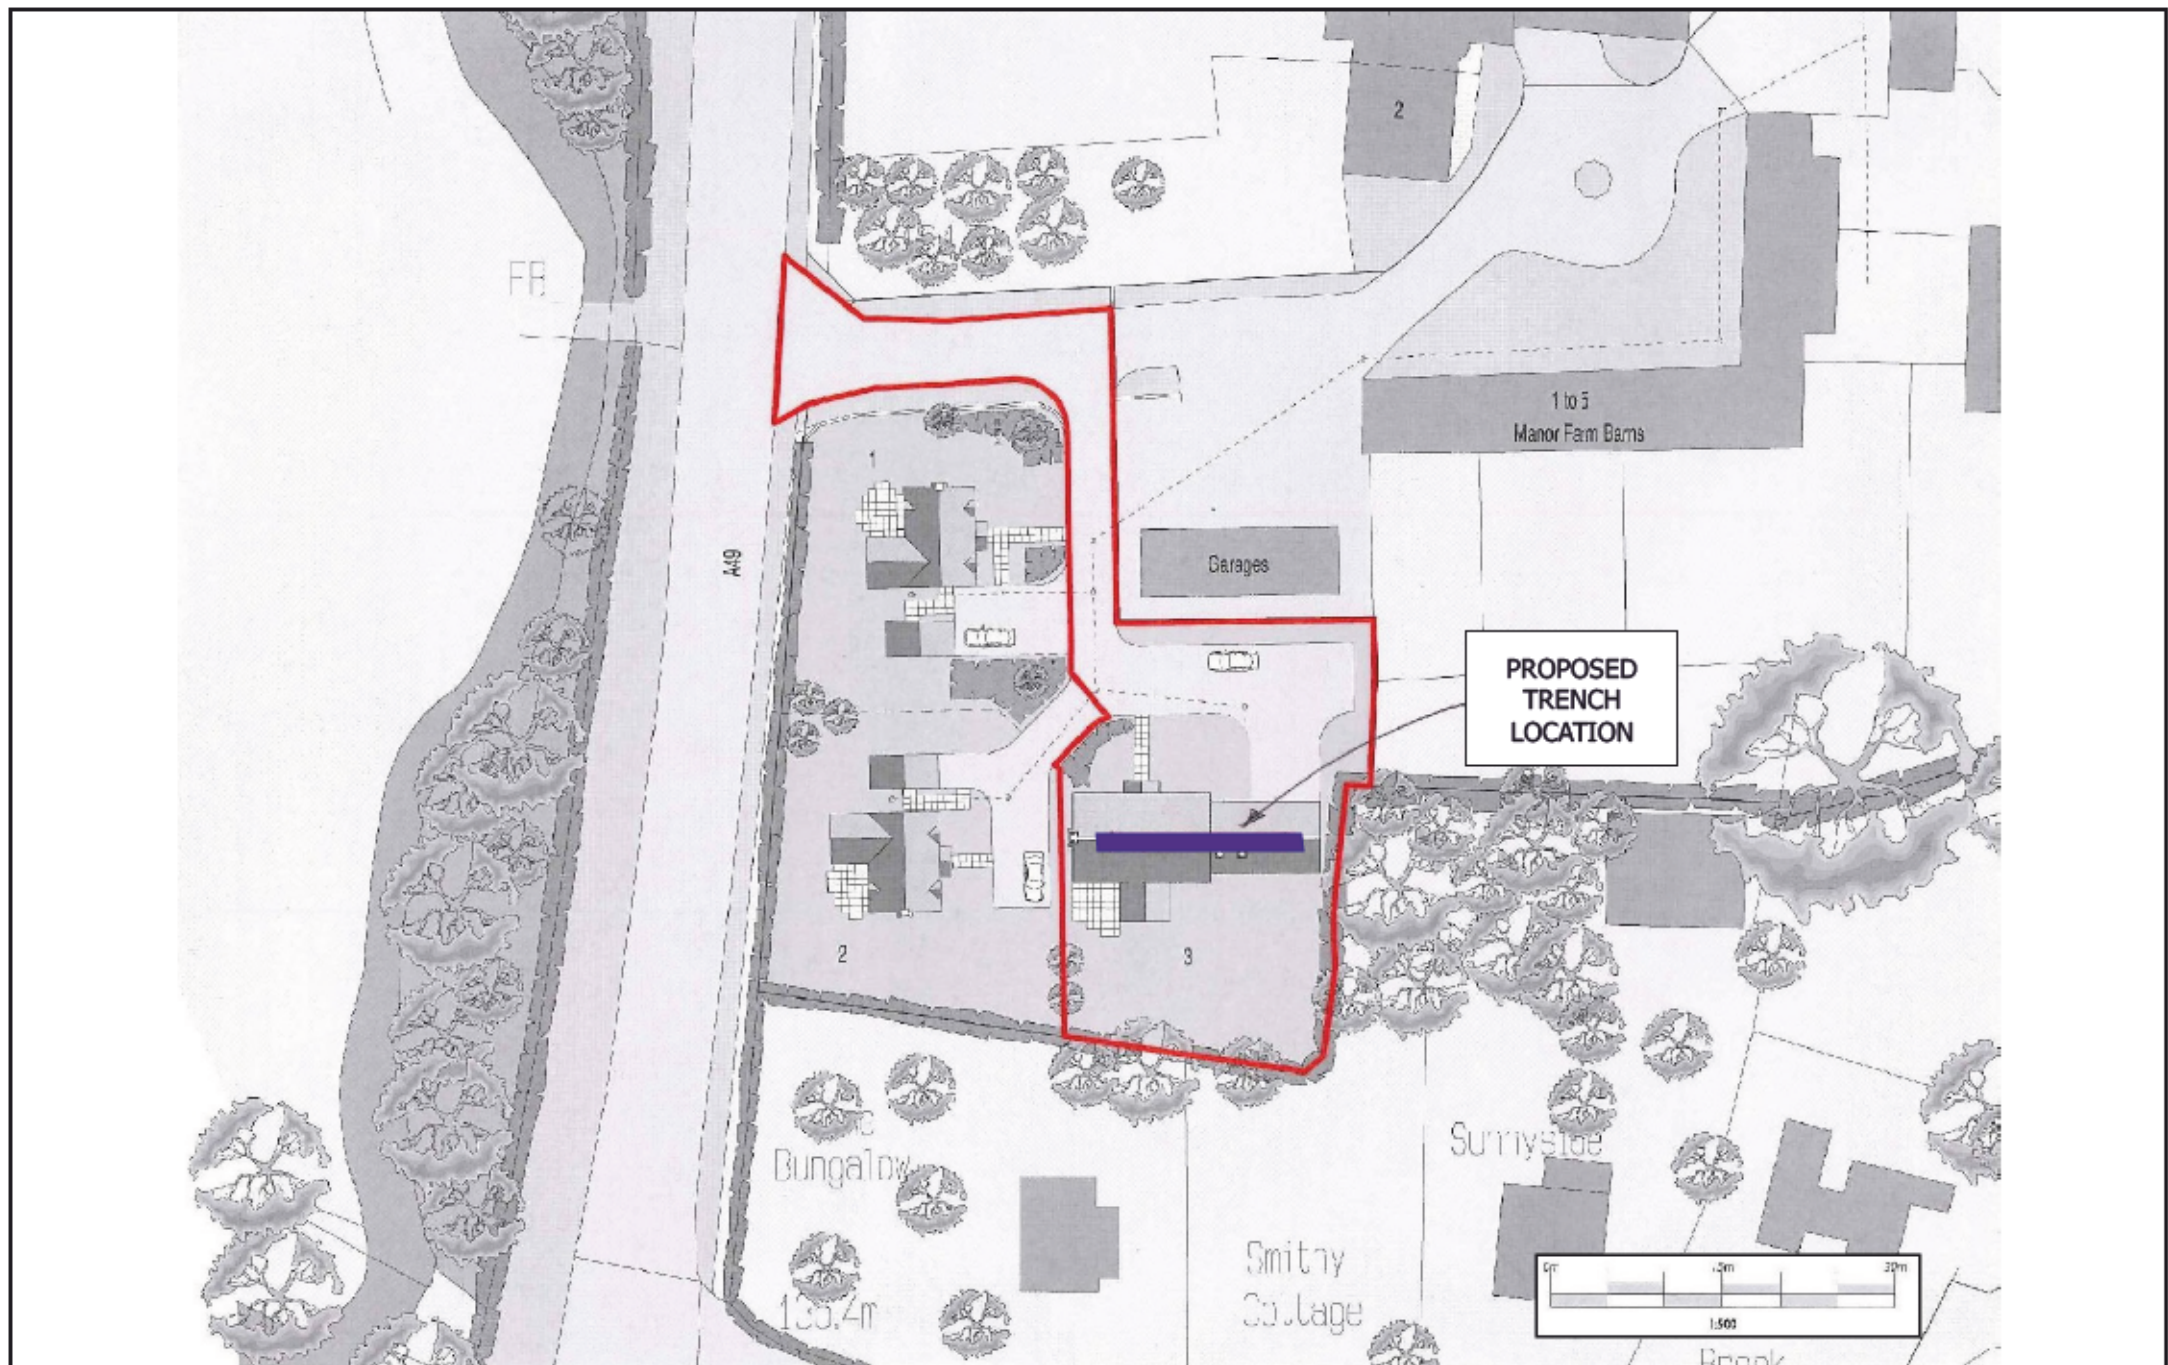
Detailed plan of proposed development area (red) and trench (blue) - from Gareth Hickman Architectural Ltd source.
